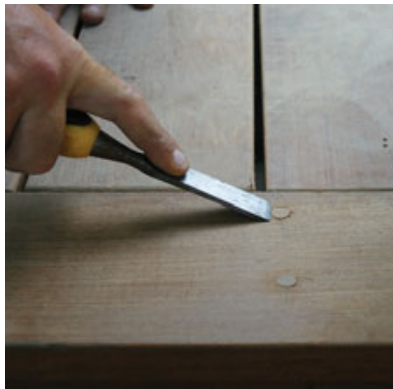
One option with hardwood is to drill oversized countersinks and plug them.
